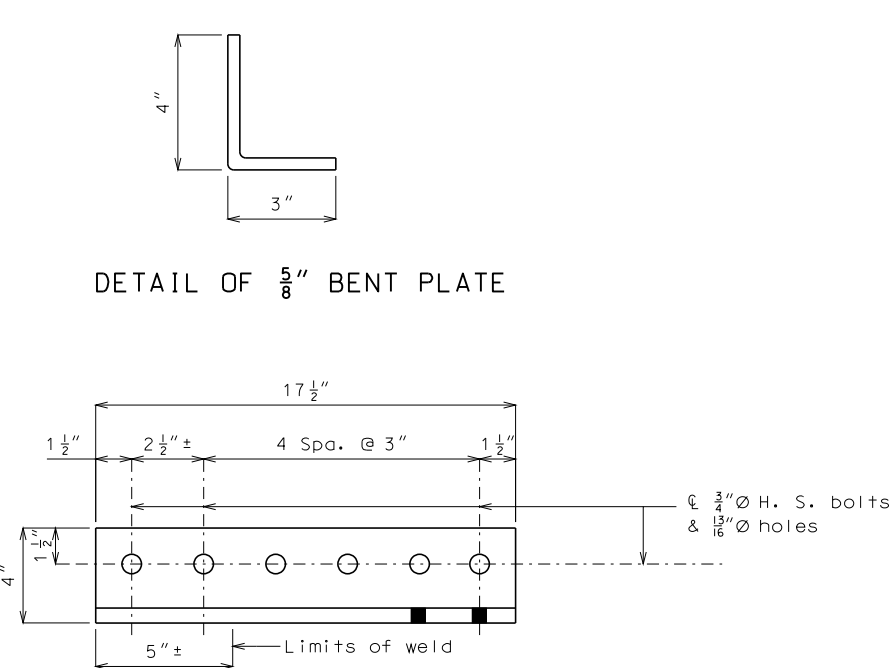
DETAILS OF FATIGUE CRACK REPAIR AND BEARING SEAT REPAIR
